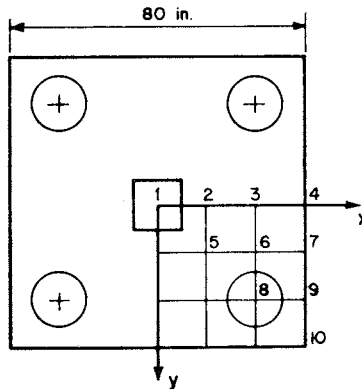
Centrally-loaded square footing on piles and subgrade.
